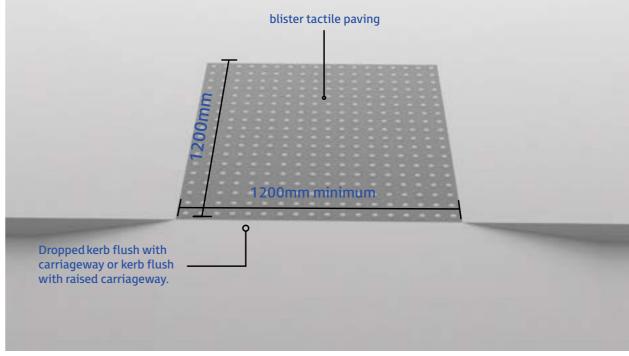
/ Tactile paving at uncontrolled crossing points with dropped kerb or raised carriageway
